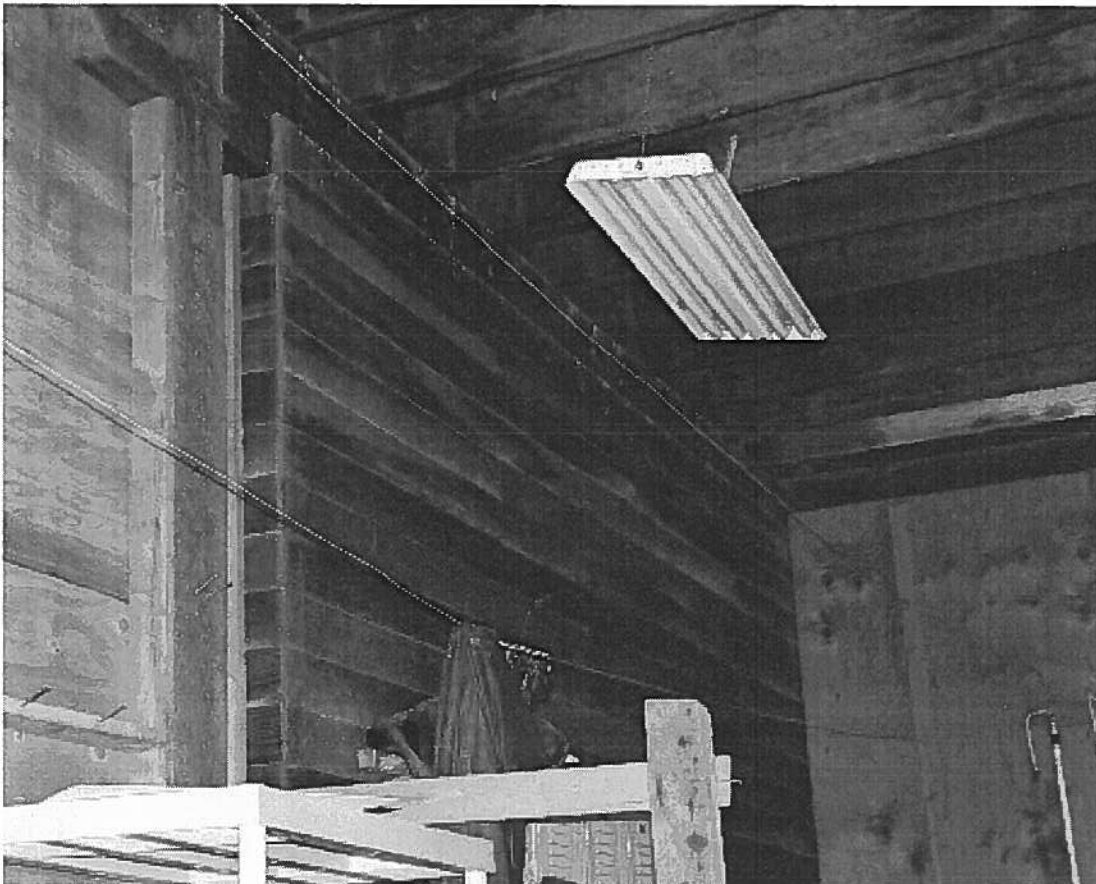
Horizontal panelled wall appears to be part of the original construction.
